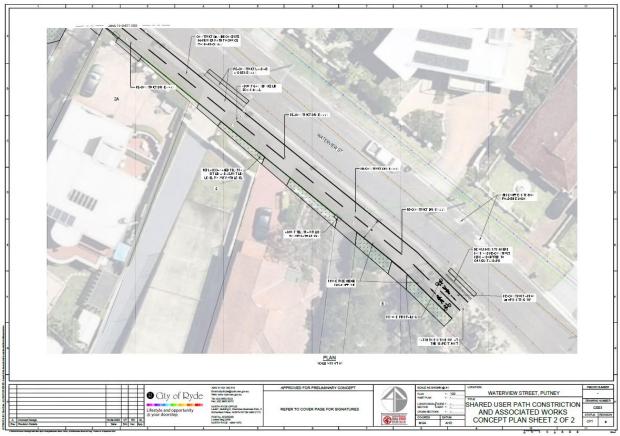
Shared User Path Construction and Associated Works Concept Plan
